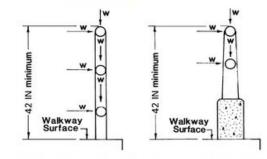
Pedestrian Railing Loads—To be used on the outer edge of a sidewalk when highway traffic is separated from pedestrian traffic by a traffic railing. Railing shape illustrative only.
